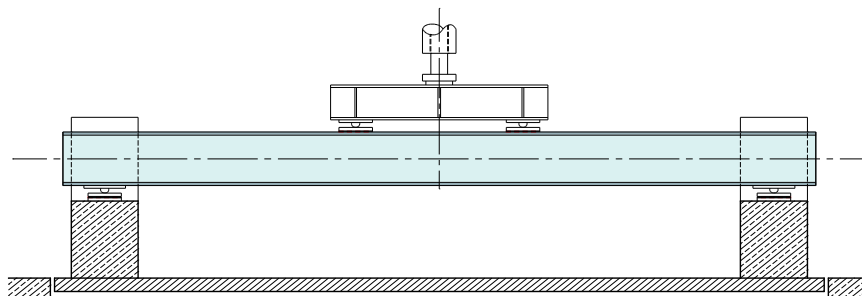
Set-up of the full-scale experiment of the hybrid steel-glass beam
